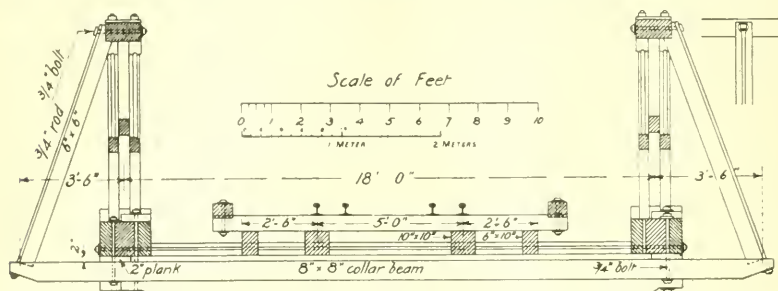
SWAY BRACING FOR PONY TRUSSES.
